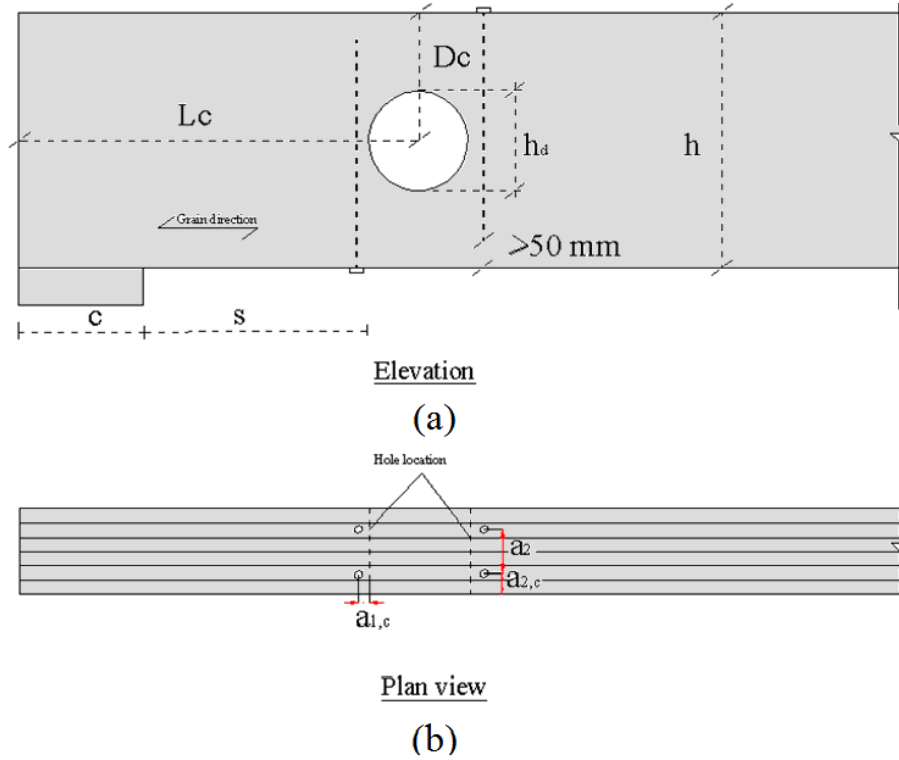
Sketch of reinforcement with screws and parameters: (a) elevation, (b) plan view
